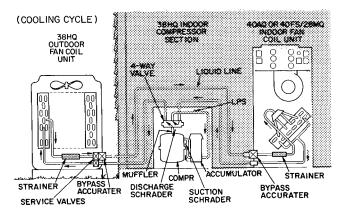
38HQ Refrigerant Flow Diagrams
